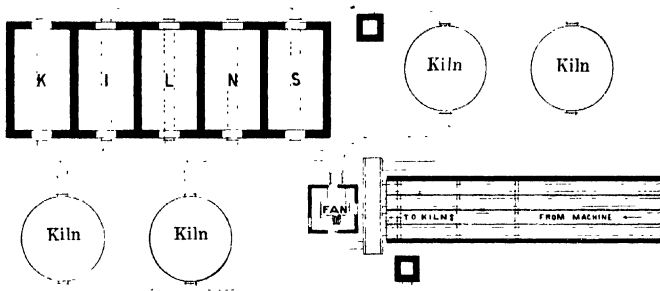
Plan showing connexion of fan, kilns, and dryer.
